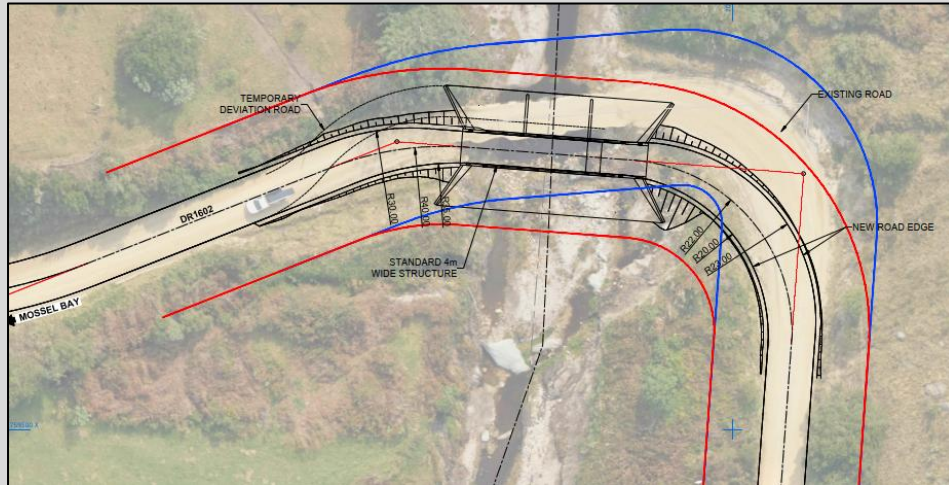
Proposed engineering layout of the new proposed causeway and culverts infrastructure showing the existing (blue) and new (red) road reserve, located on DR1602 km 8.4. (Hatch Engineering, 2026).
